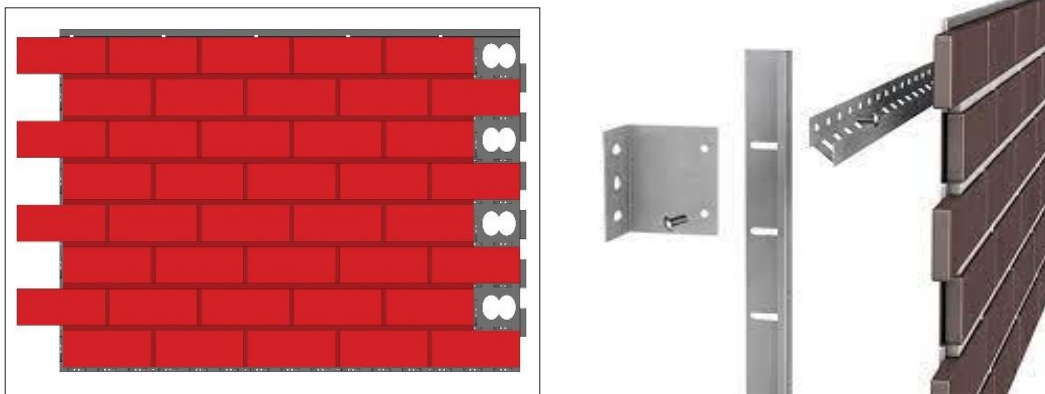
Typical Stofix Brick Cladding panel front view (a) and its mounting system (b).
